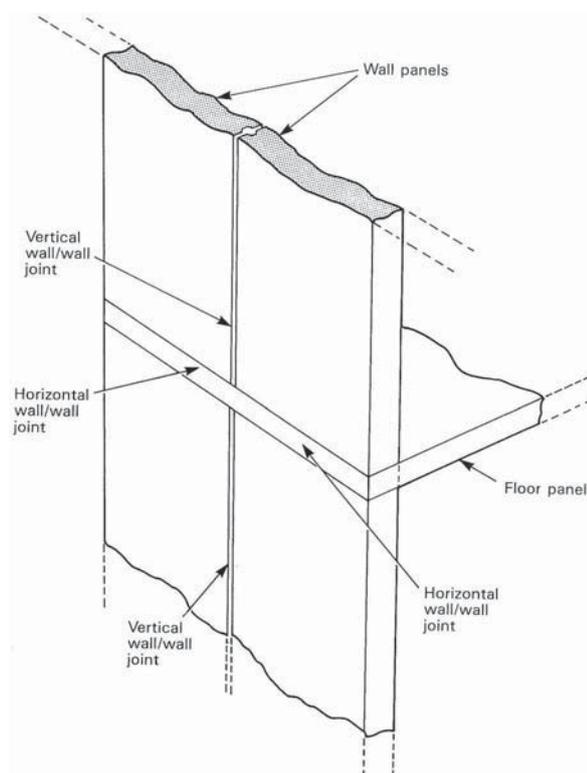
Schematic diagram of the various joints between flank wall and floor panels in a typical LPS dwelling block
